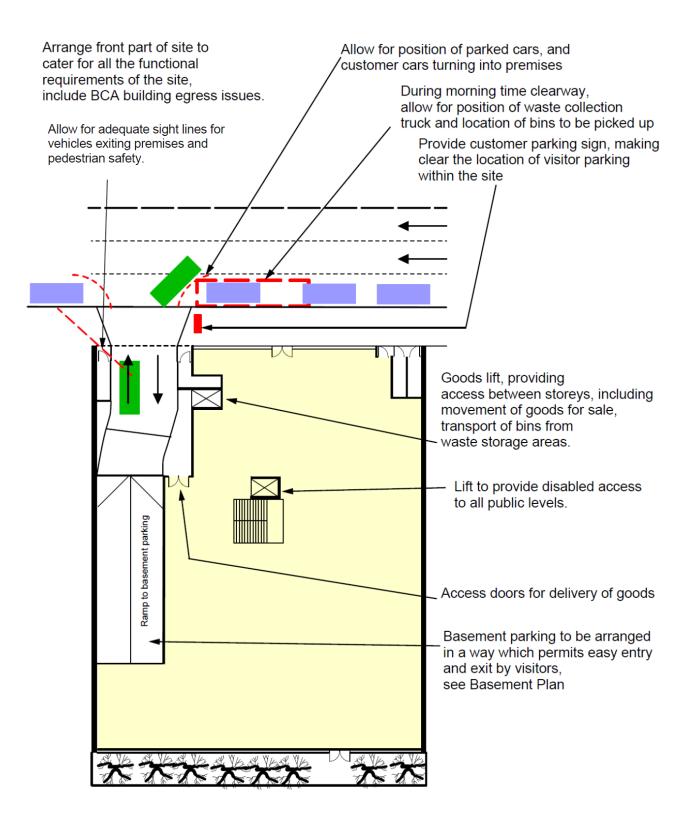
Site Access and Parking Location Principles diagram for consideration of site width and commercial development showing ground floor plan (level 1 plan not shown).
